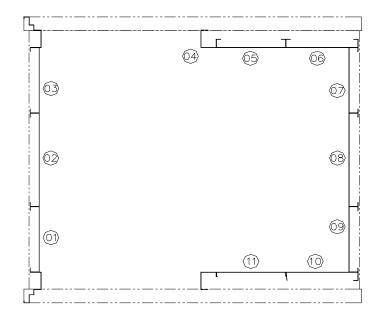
A. CAR PANEL AND ENTRANCE COLUMN ASSEMBLY
